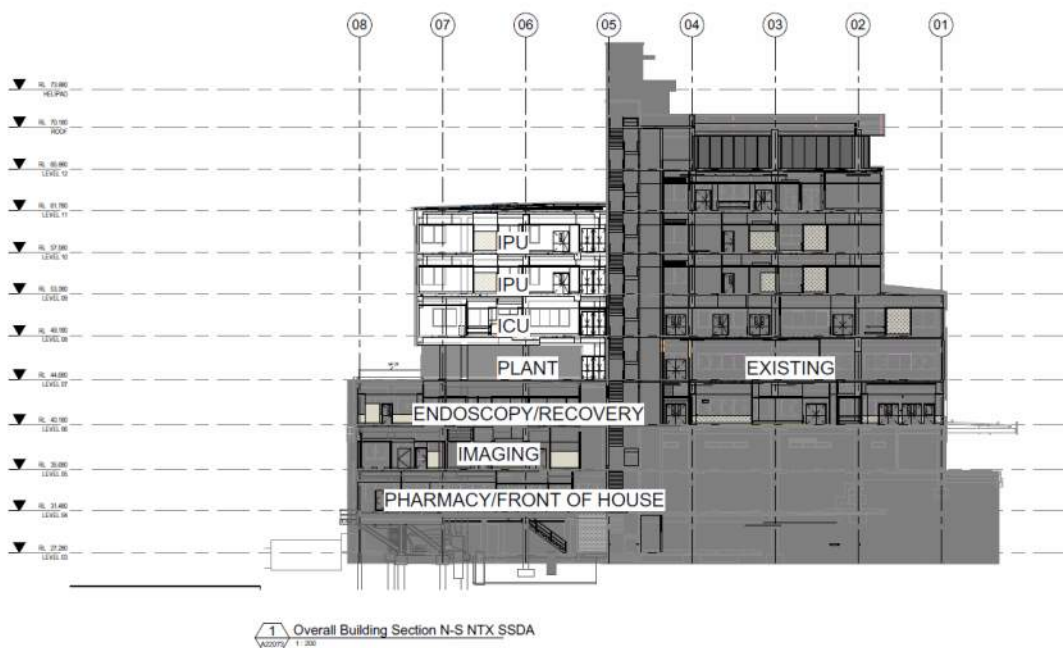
North-south section cut through the Stage 3 development (Source: CGA)
